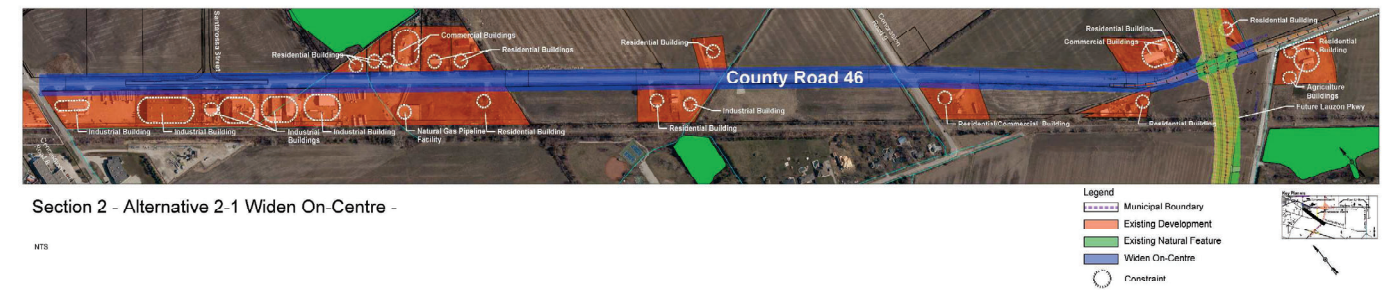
County Road 46 Section 2 Alignment Alternative 2-1
